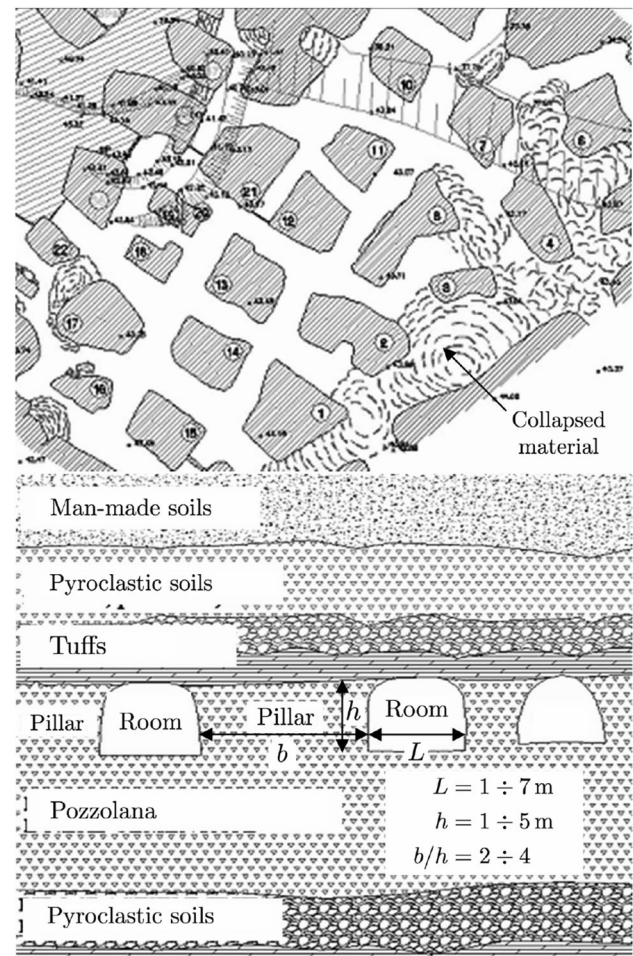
Typical geometry of geotechnical system: representative plan of system of shallow cavities found in Roman subsoil
